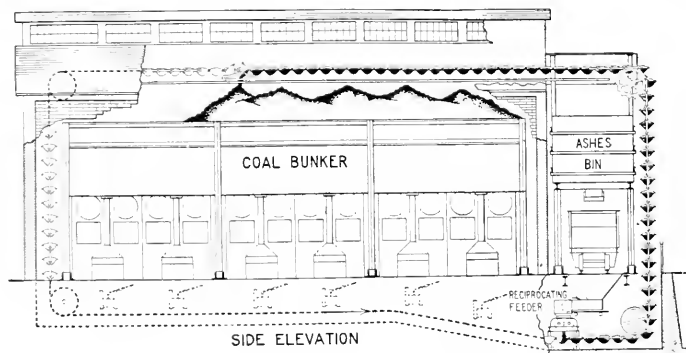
BOILER ROOM EQUIPPED WITH CONVEYOR HANDLING COAL AND ASHES
